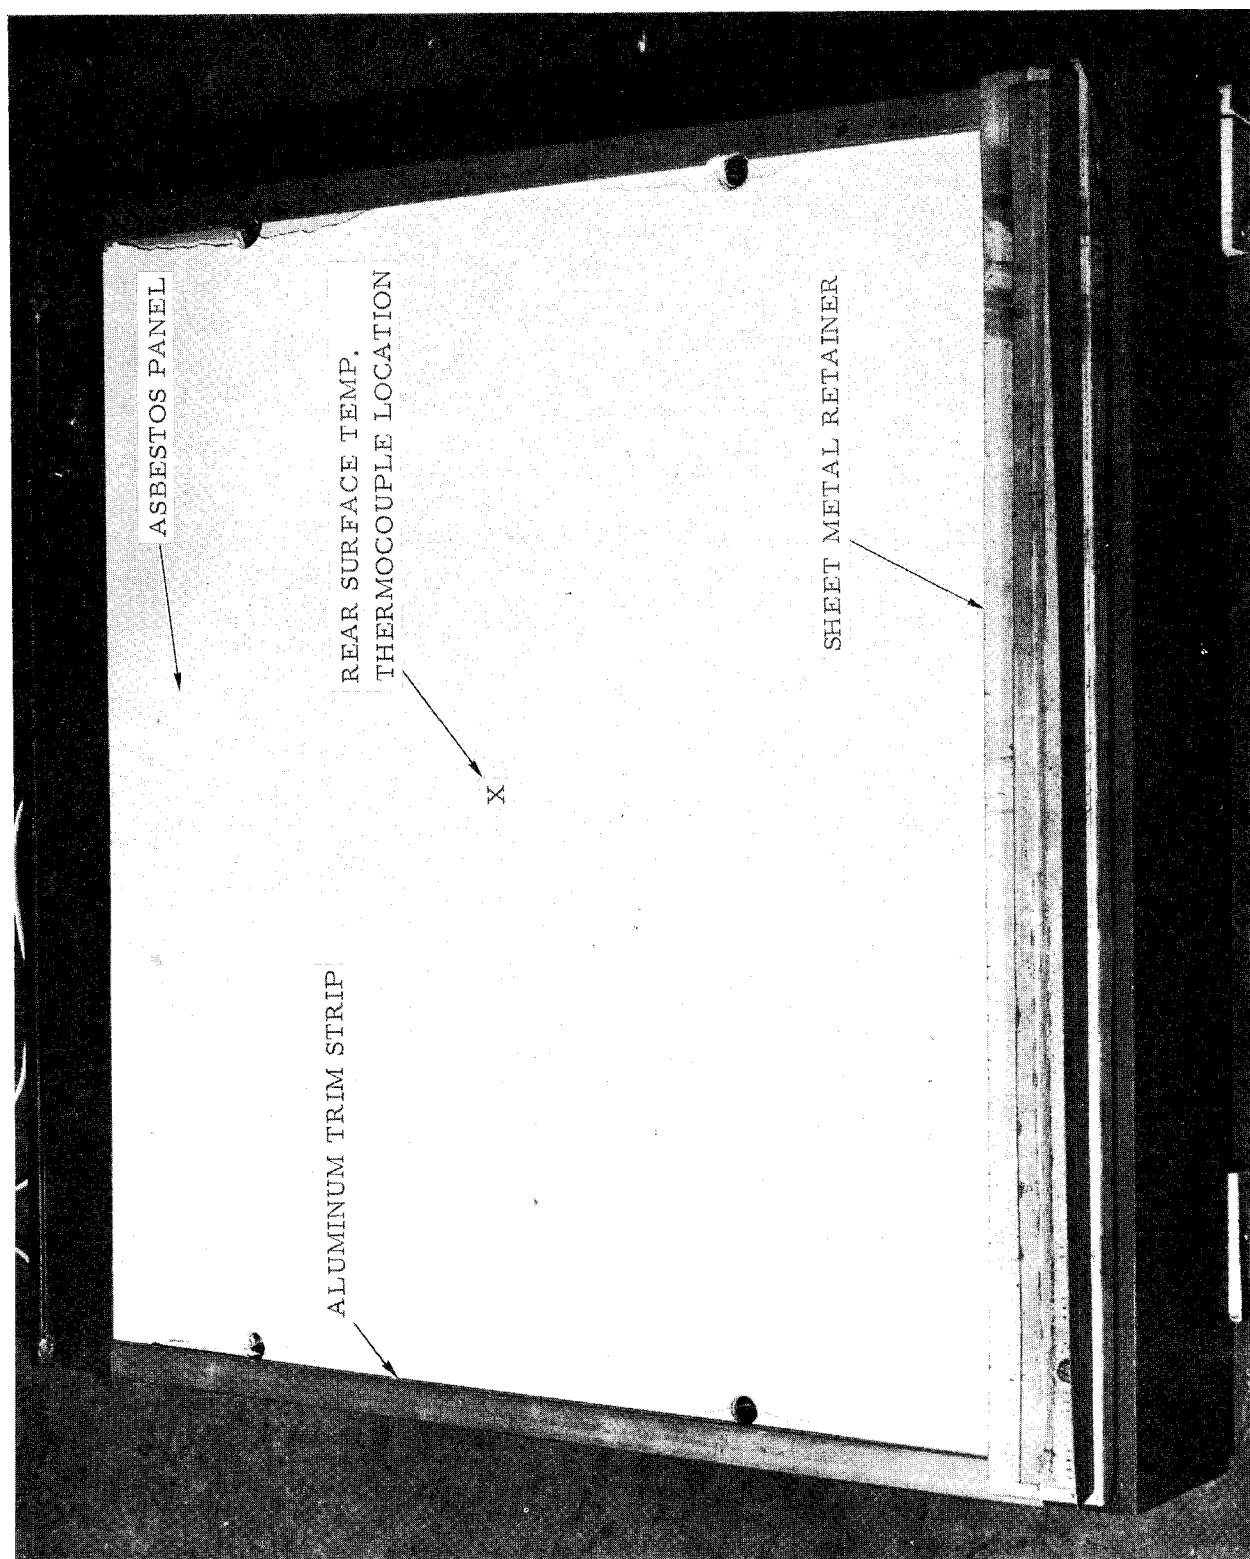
PANEL NO. 1 - WALL SECTION INTERIOR ASBESTOS
